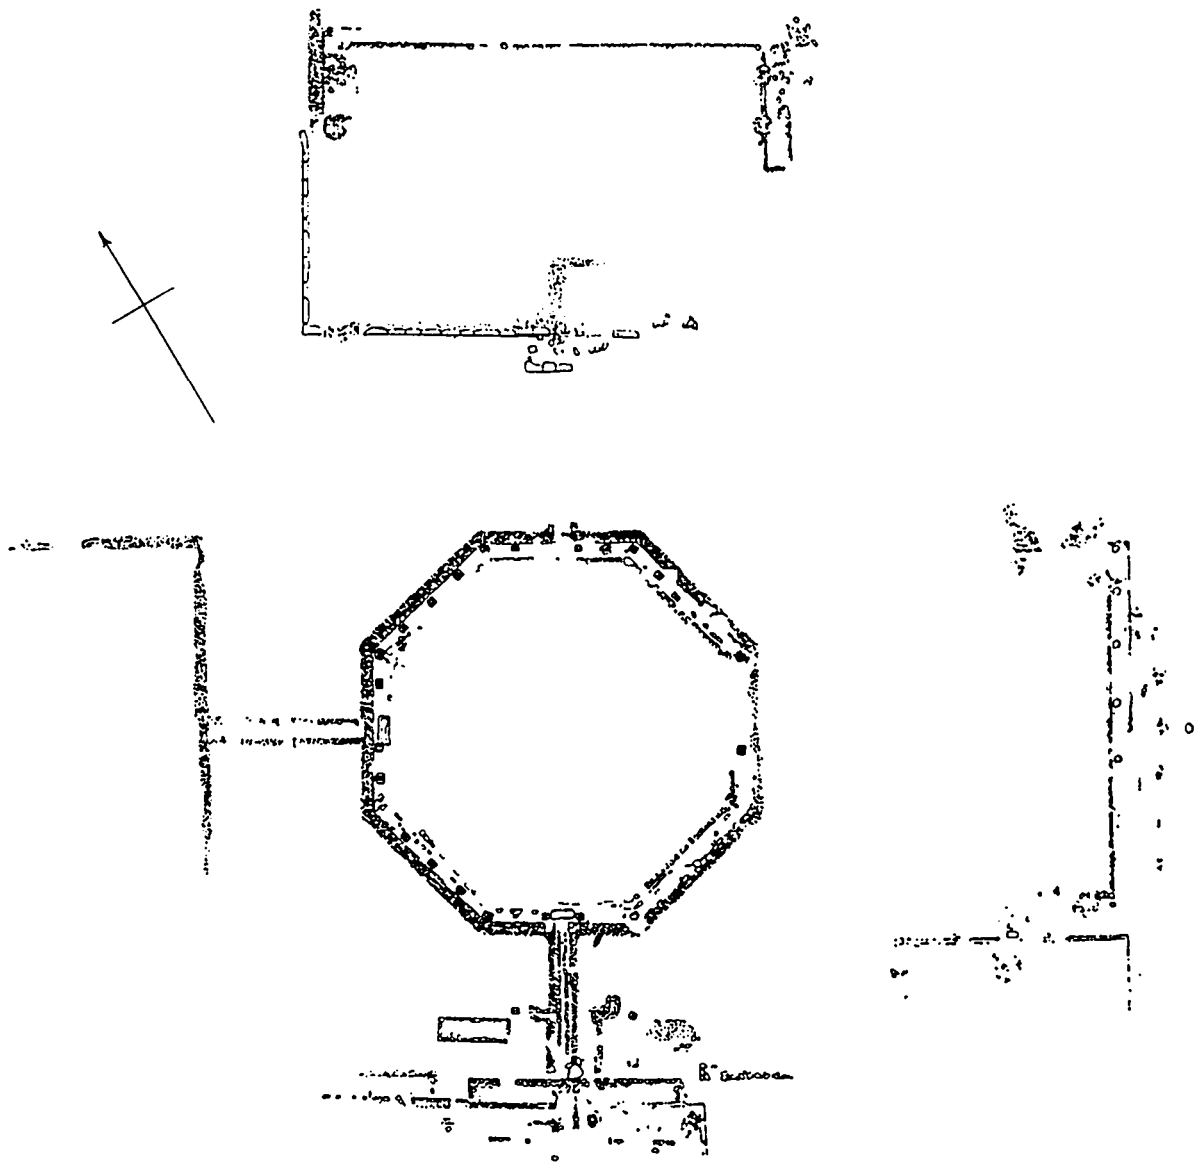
Excavation plan of Güm-gang-sa 金剛寺 (498 AD?, scale: 1 : 500)
